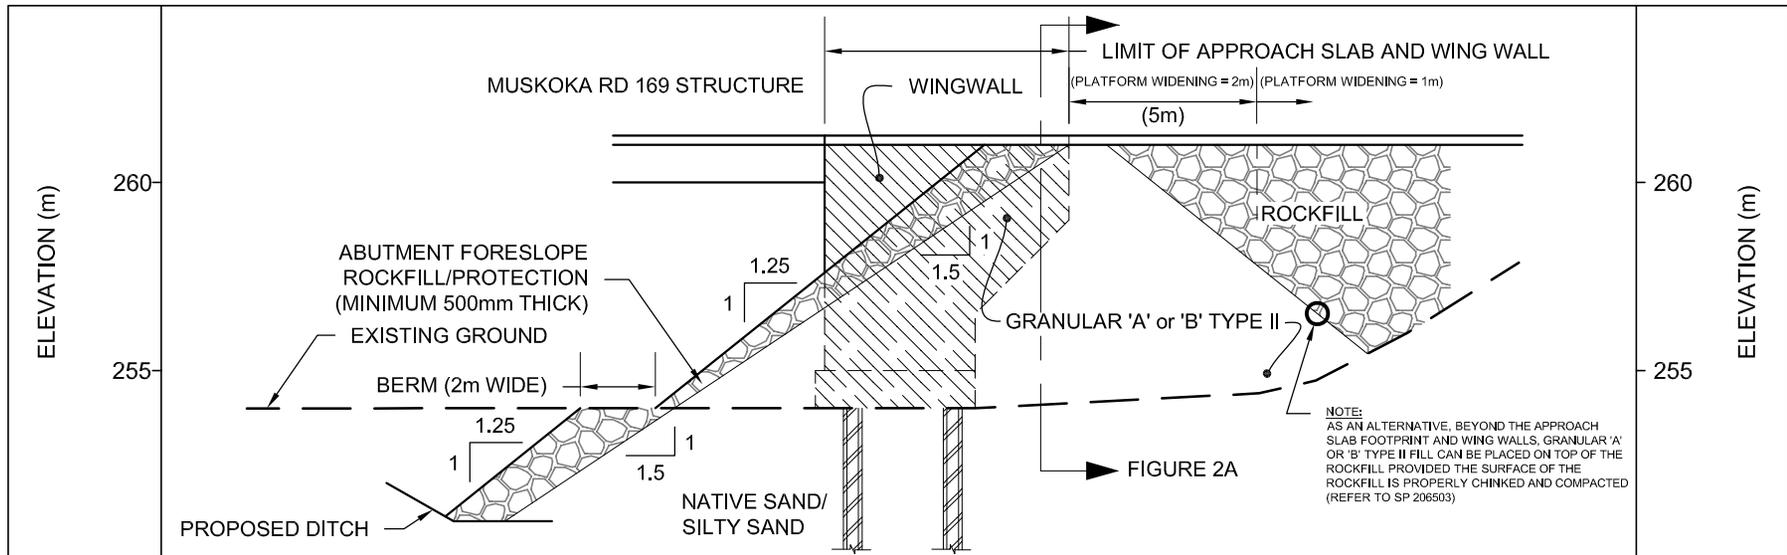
B - TYPICAL PROFILE SECTION AT EAST ABUTMENT
